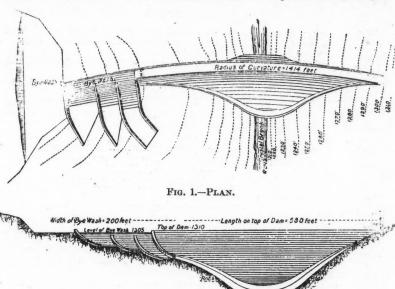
ELEVATION. THE BEETALOO DAM.
